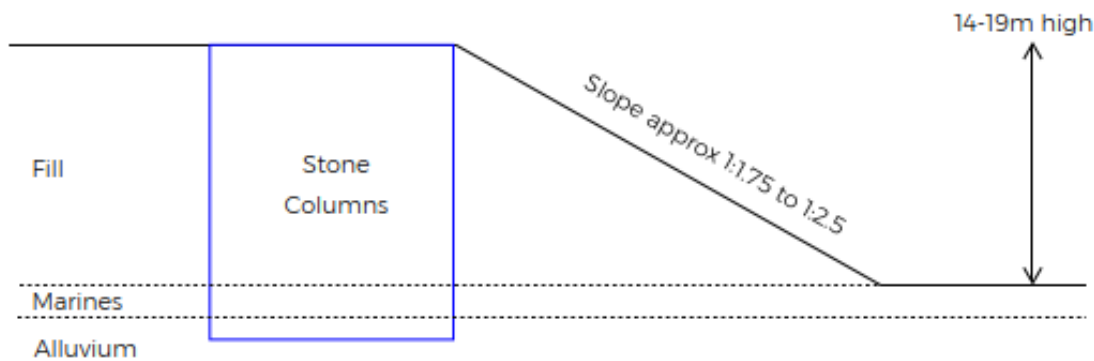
Sketch of general ground improvement layout with nominal width and typical soil profile
